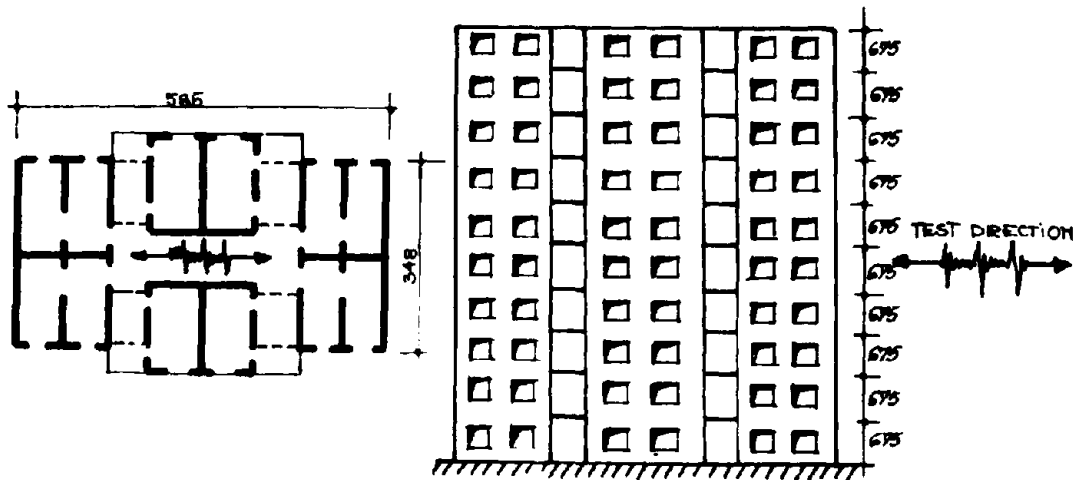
PLAN AND ELEVATION OF A 1/4 SCALE MODEL
